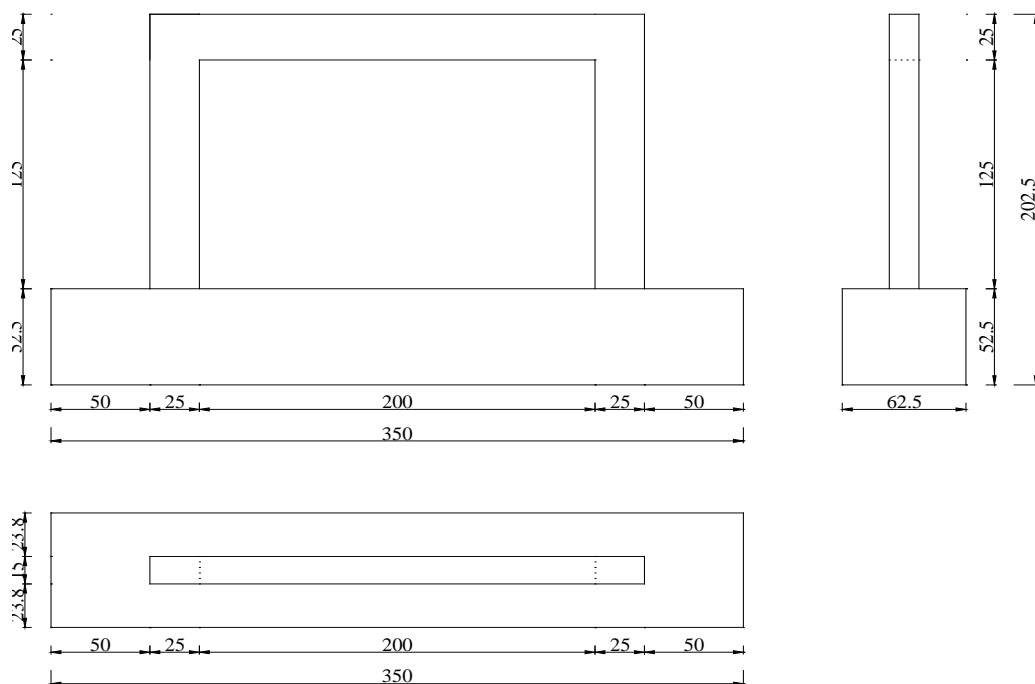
Lateral, top and front views of reinforced concrete frame (the units are cm.)
